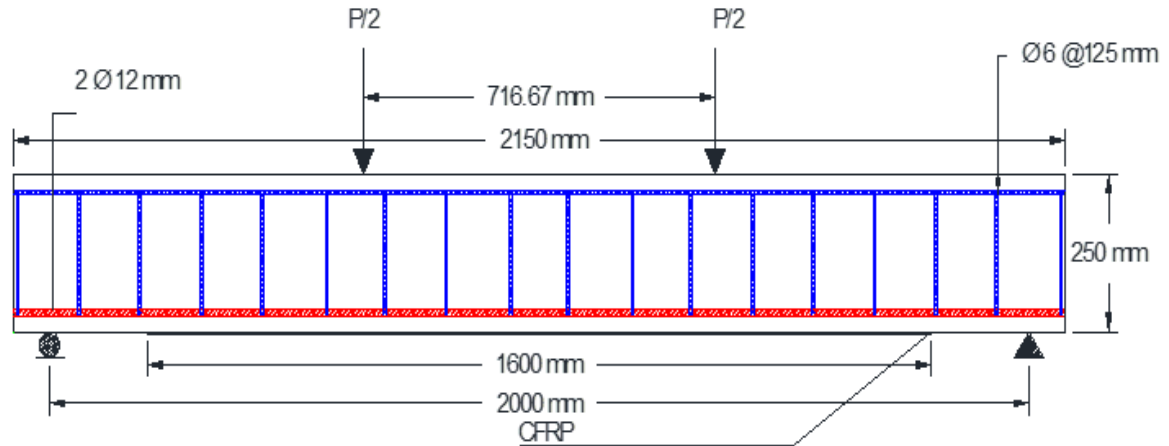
Geometry of Reinforced Concrete Tested beams
